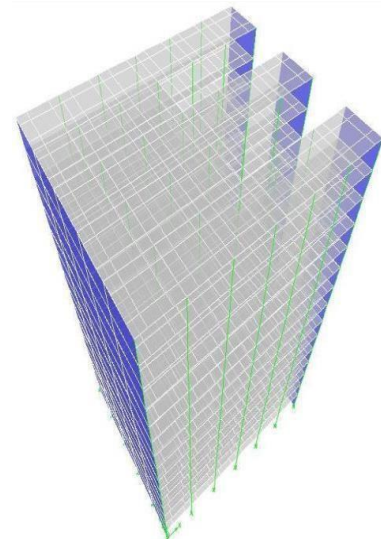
E-Shaped model with Flat Slab and Shear Wall at Re-Entrant Corners
